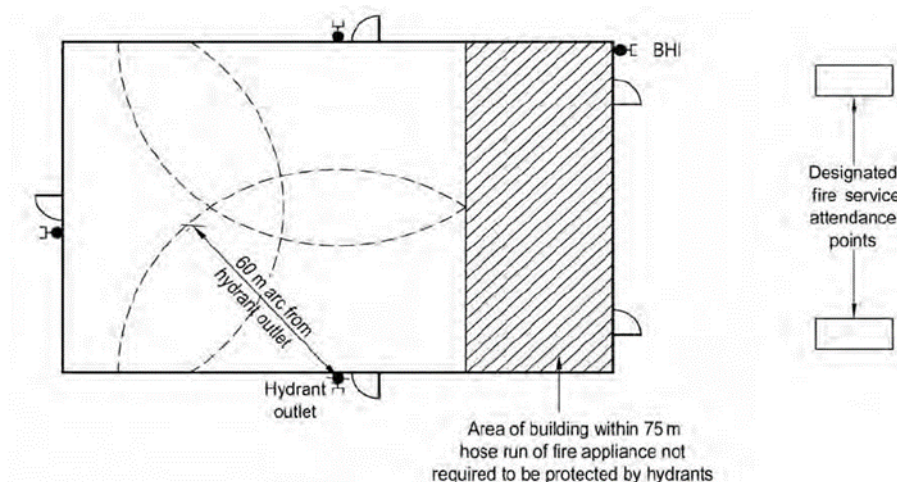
External hydrant outlets and access (Source: NZS 4510:2008 Figure p89 © Standards New Zealand 2022 LN001514)
